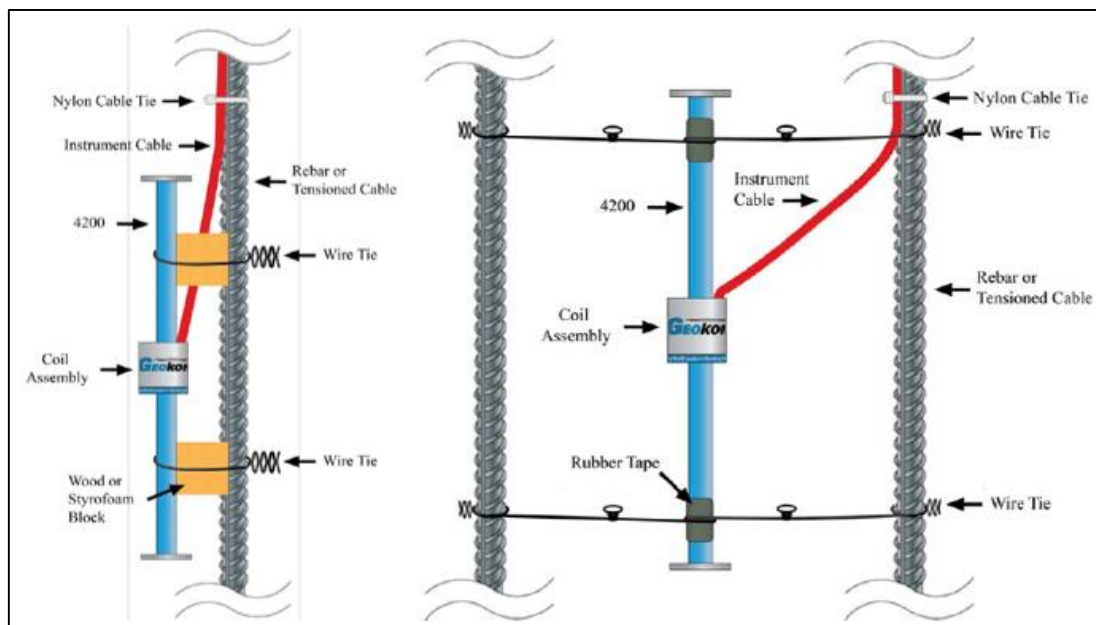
Strain gauge connections detail: attached to rebar (left) and suspended between rebar (right)
